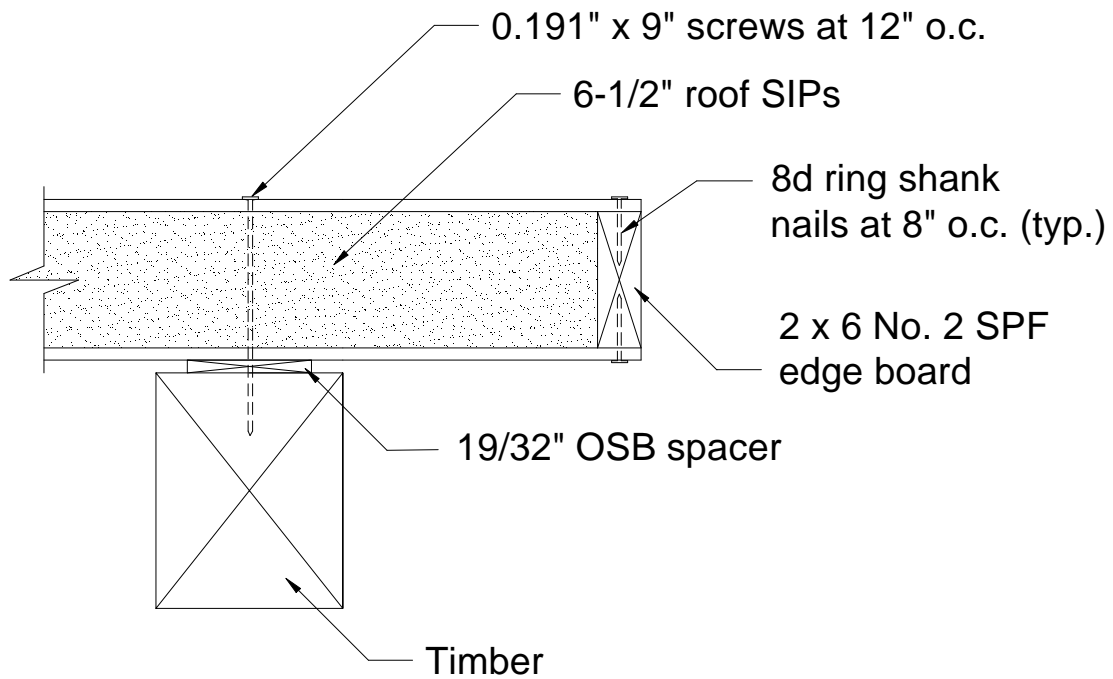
Example of edge board installation around perimeter of SIPs. (Nails were placed only through the top of SIPs at locations where edge boards were on top of timbers.)
